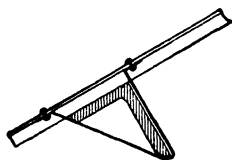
Sheets Fastened to Angle-purlin by Band-iron Cleats
